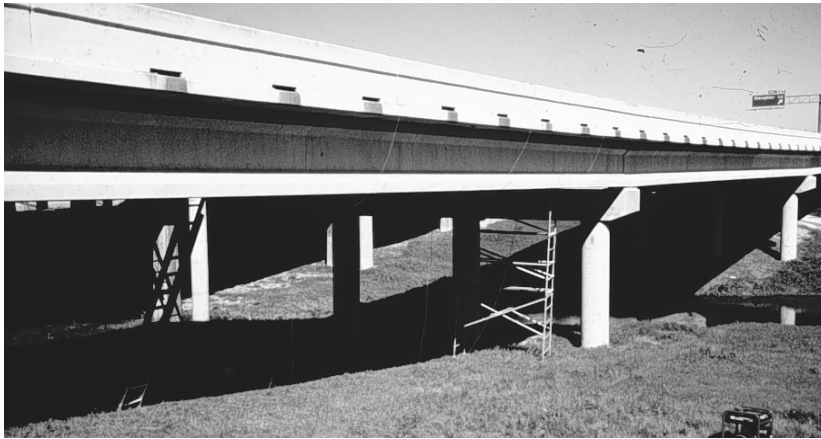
Side View of the Instrumented Span at the Slaughter Creek Bridge
